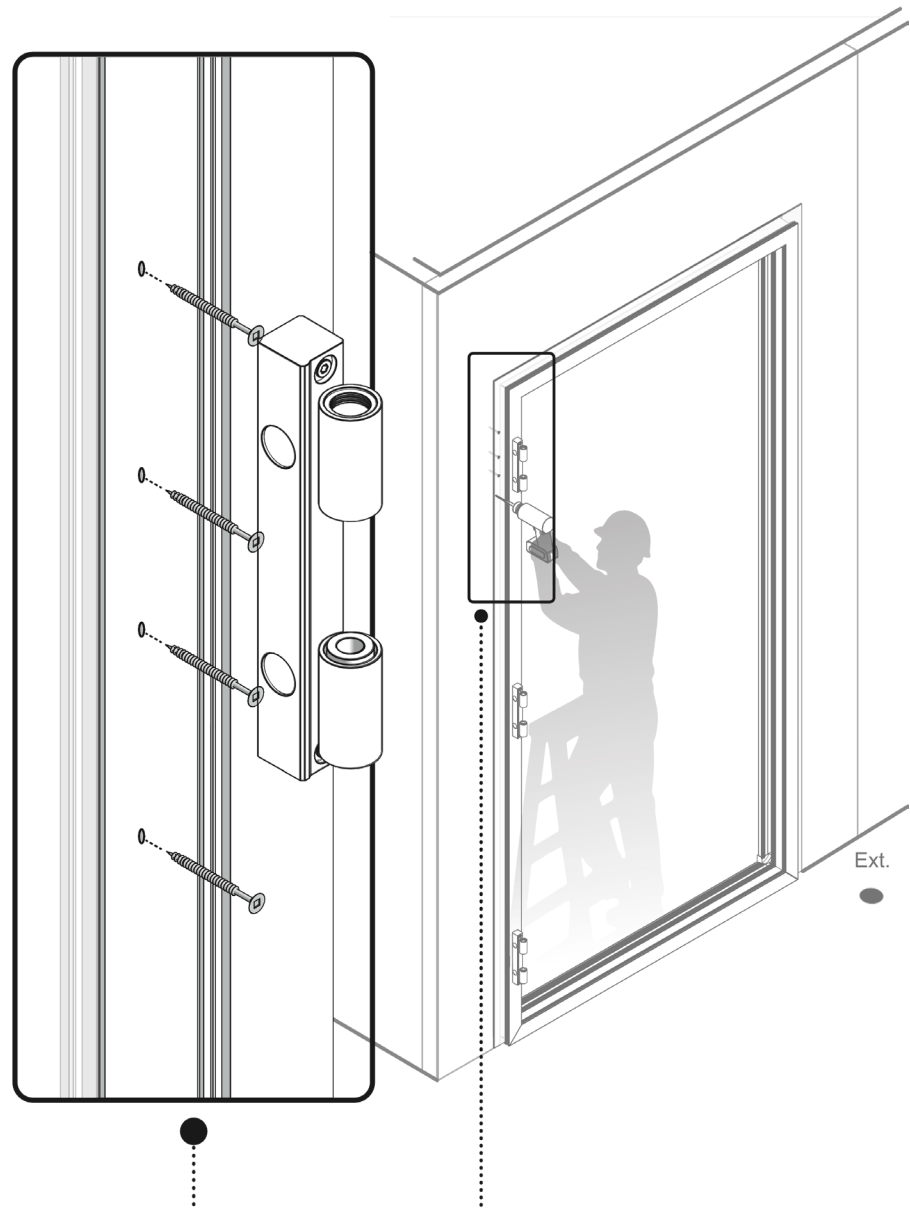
Fastening Door (76TS Outswing) Frame to Rough Opening
